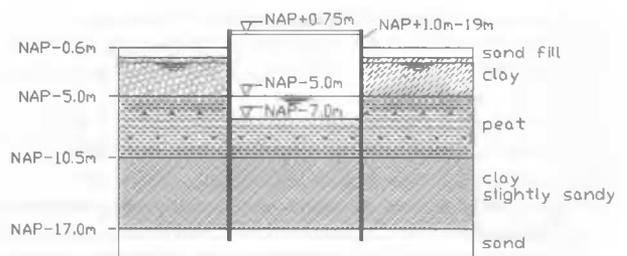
Side view of the Rotterdam sheet pile wall field test.
